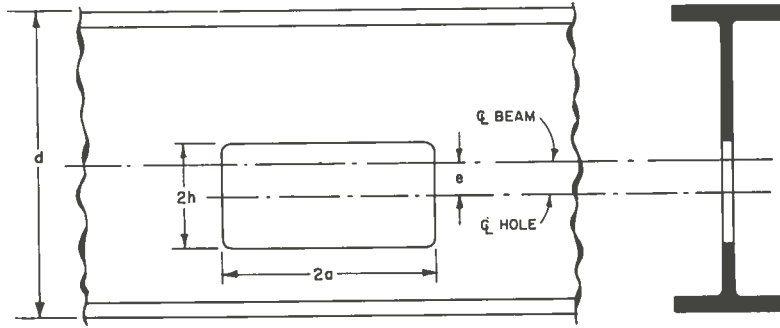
Elevation and cross-section of beam with eccentric rectangular web hole.
